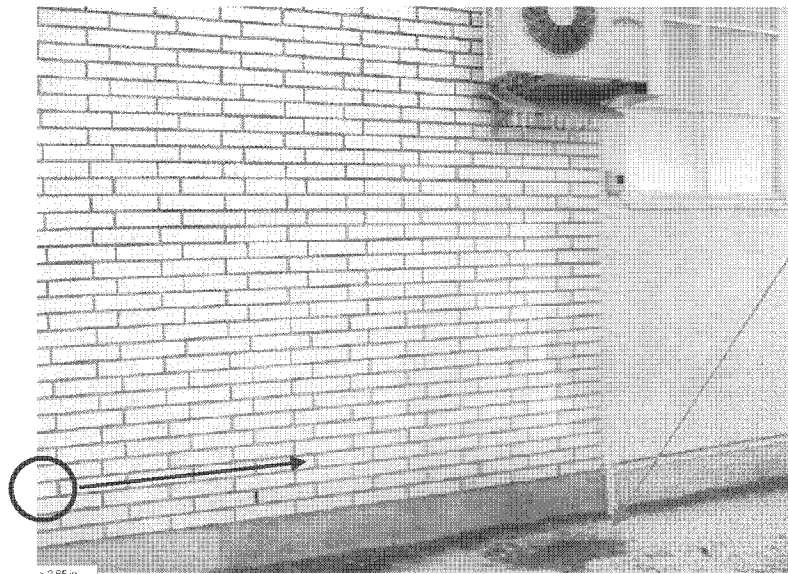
Photo of the ad hoc installed air conditioning. Mildew stains in fig’s 1 and 2 where found only at the inside ceiling in the left corner along the arrow of this photo.
